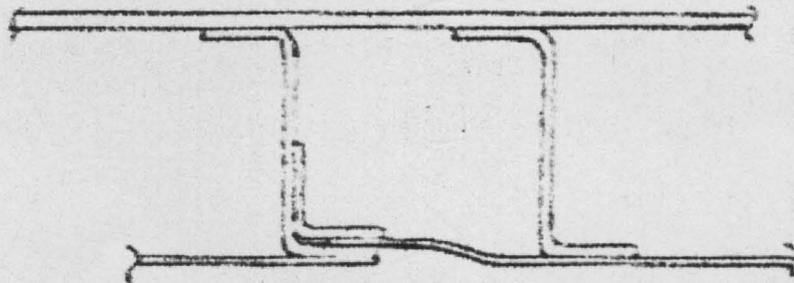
PROPOSED JOINT FOR LONGITUDINAL EXPANSION OF INNER EXTENSION WALL.
